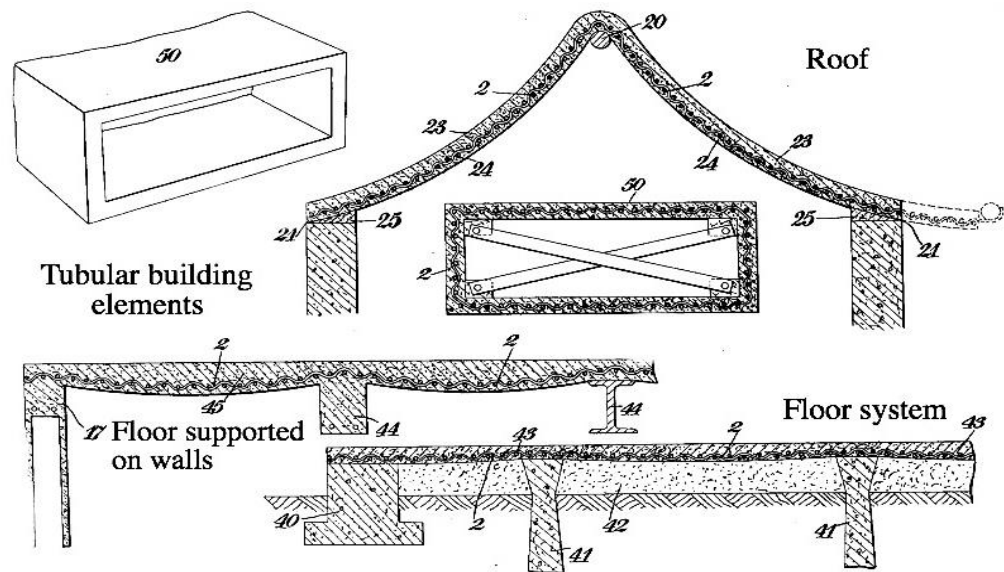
Patented fabric-formed building elements by (Waller, 1934)
